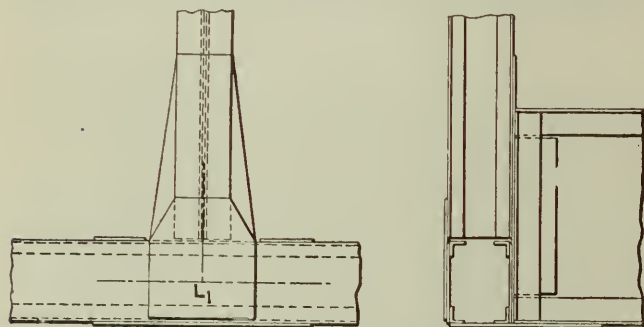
CONNECTION OF FLOORBEAM TO HIP VERTICAL BY SIMPLE GUSSET PLATE
